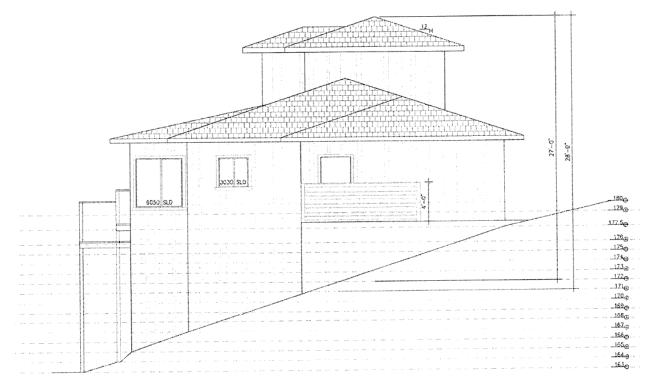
(East/Garage Elevation, Detail from Prior Residence Building Plans Sheet A3.01)
